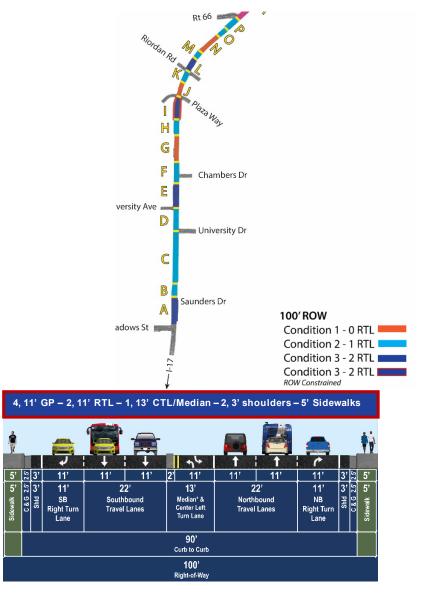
Short-Term Recommended Cross Section: Forest Meadow Street to Route 66
